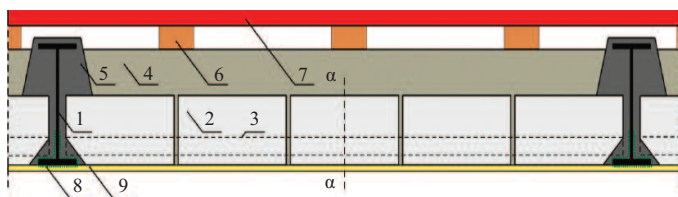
Typical cross-section Klein slab: 1 – steel I-beam; 2 – brick; 3 – brick slab reinforcement (flat bars or rods); 4 – lightweight concrete; 5 – concrete or mortar; 6 – wooden joists; 7 – floor layers; 8 – Rabitz grid; 9 – plaster
